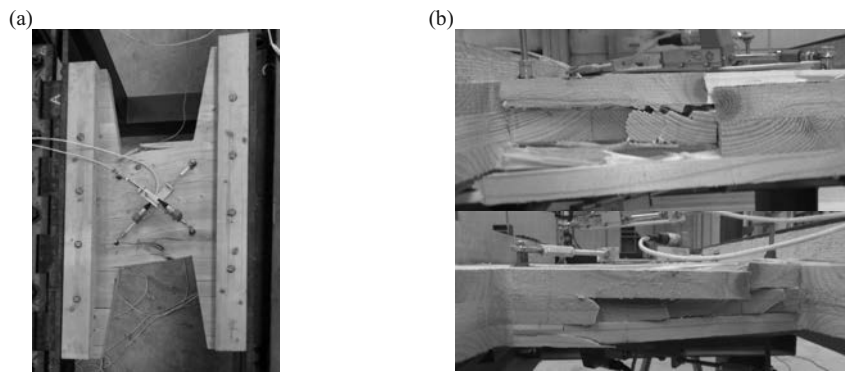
Failure of panels: overhead view (a) and two lateral views (b).
